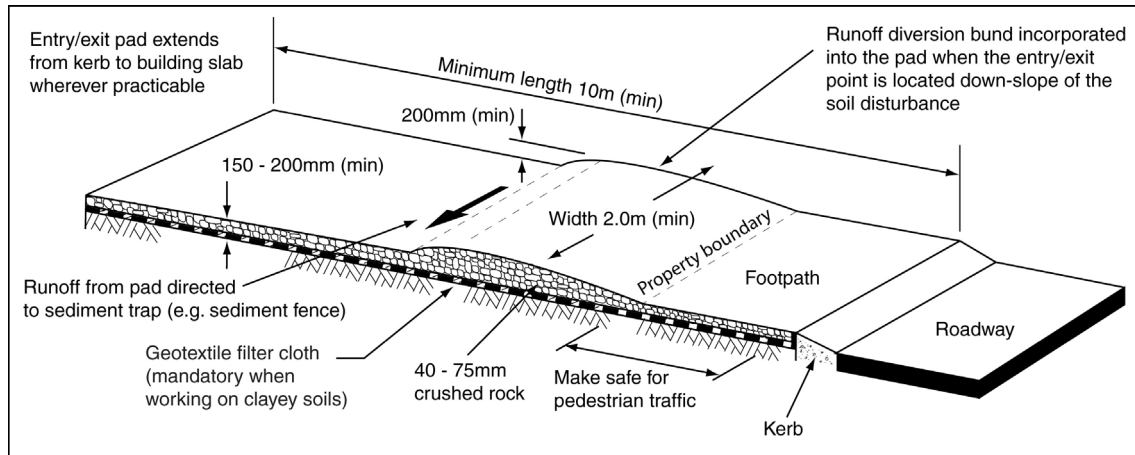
Stabilised rock entry/exit pad for building sites (not construction sites)
